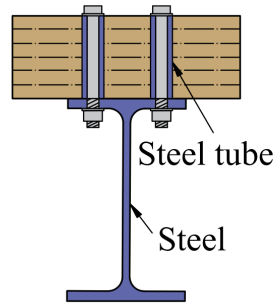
Typical bolt shear connection in a STC beam [33]
